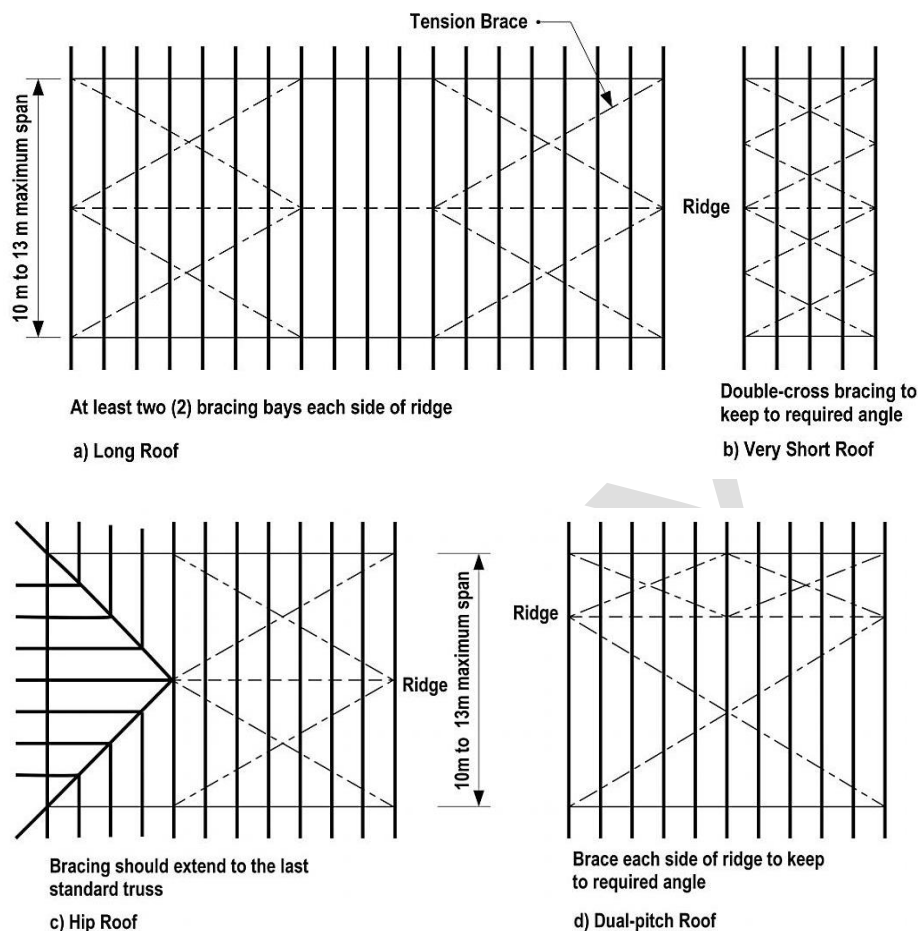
Suggested Roof Bracing Layout (Tension)
